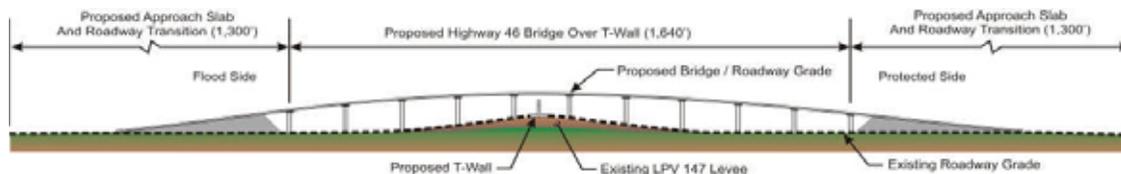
Highway 46 Crossing over Hurricane Protection Levee
